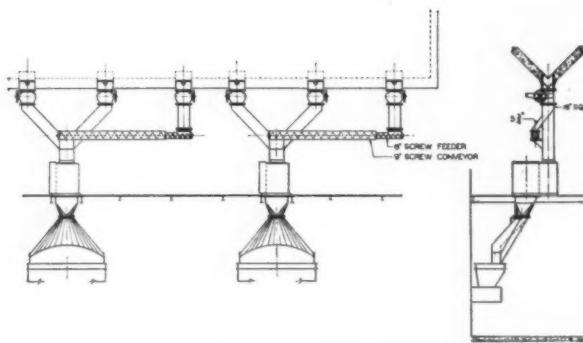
Arrangement of an improperly designed screw conveyor used to reclaim coal from dead spots between principal bunker outlets
